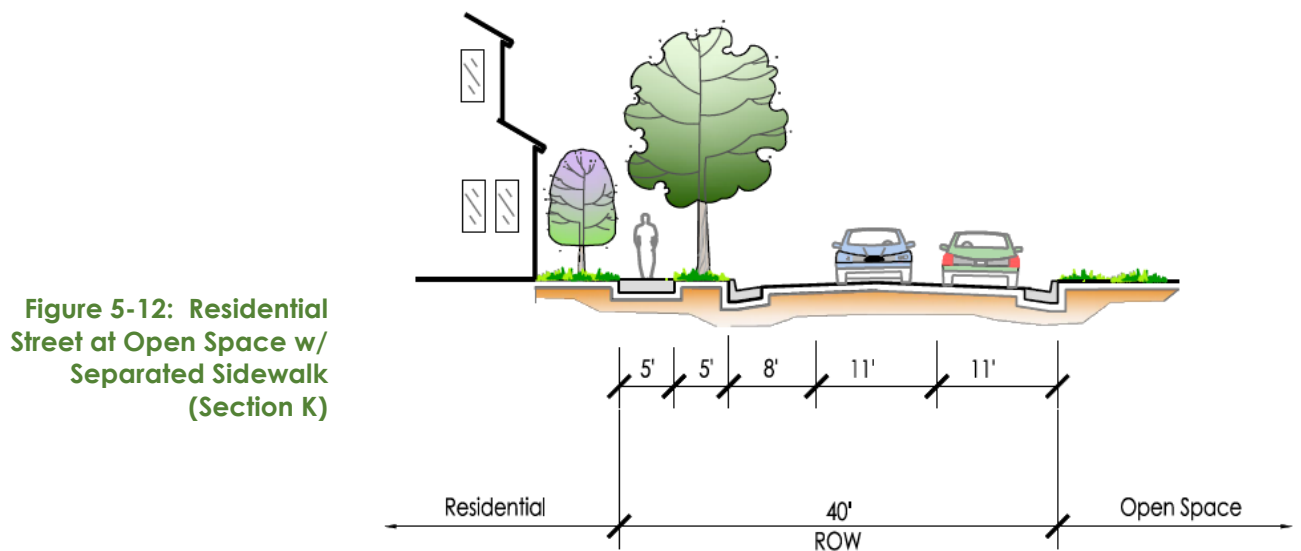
Residential Street at Open Space w/ Separated Sidewalk (Section K)
